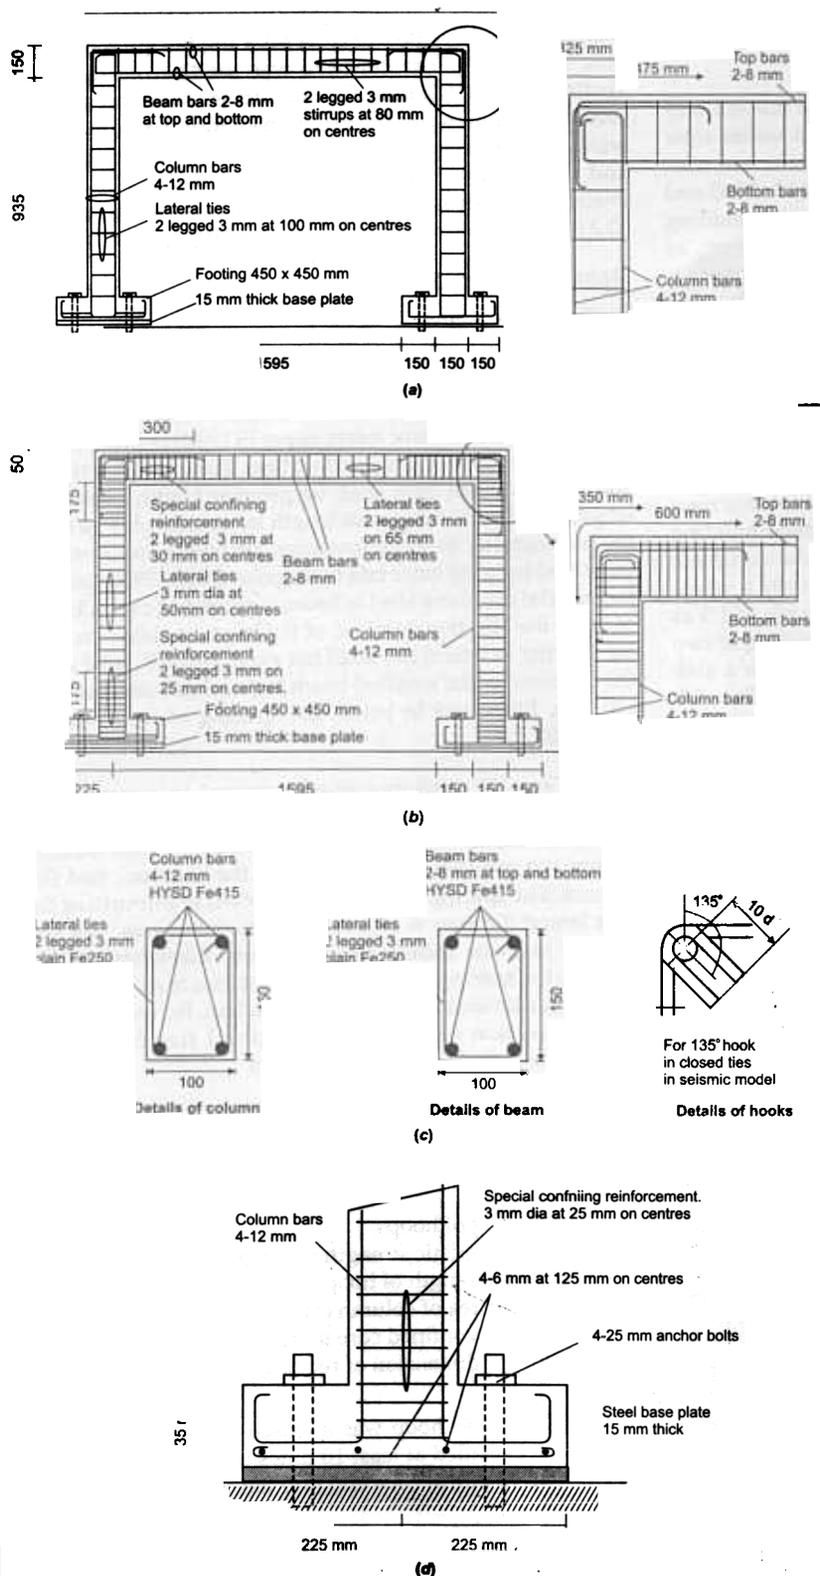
Reinforcement details of RC frames (a) non-seismic detailing in accordance with IS 456, (b) seismic detailing in accordance with IS 13020 (c) anchorage details of column, beams and hooks and (d) seismic details of footings
